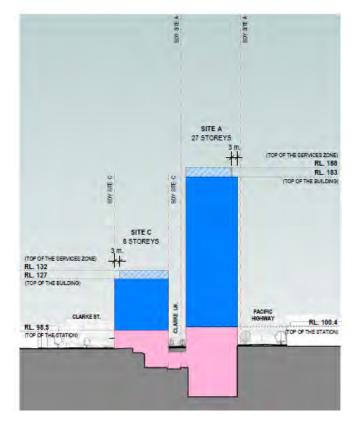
Proposed Crows Nest OSD building envelopes - cross section through the site (east-west)
